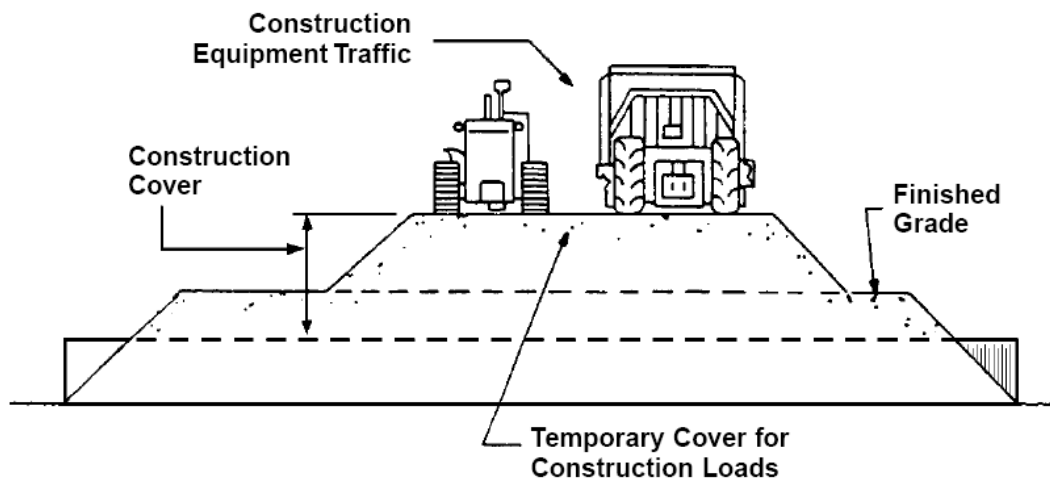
Temporary Cover for Construction Loads (UDOT 2008)
